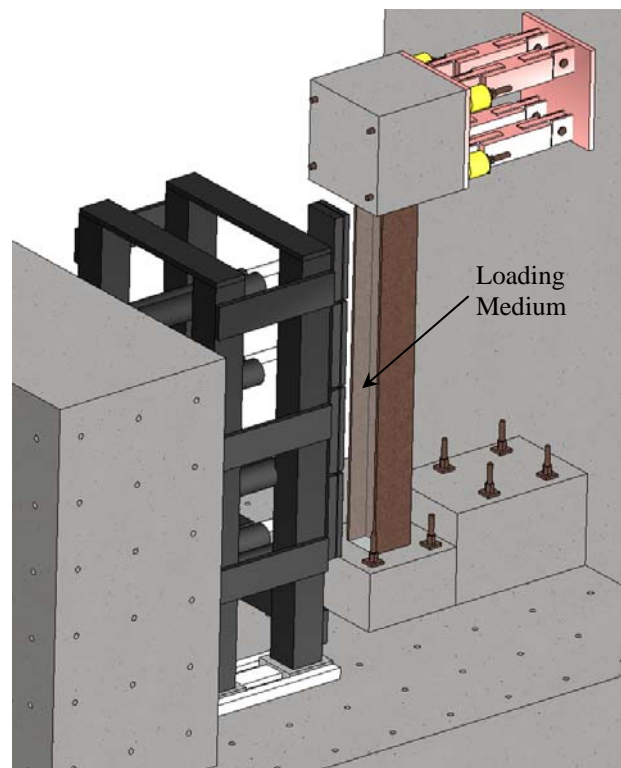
Steel Column Weak Axis Test Setup with Loading Medium
